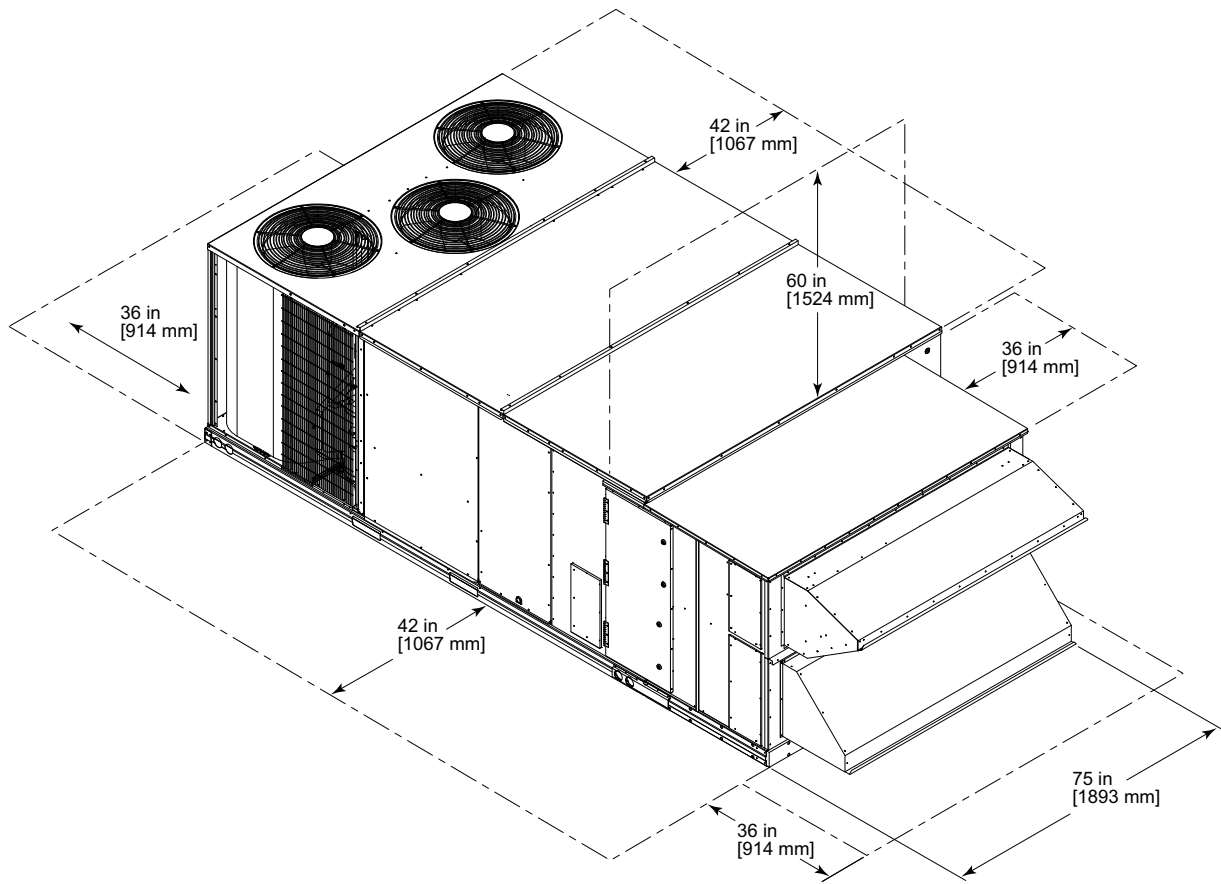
Clearances for ERV on Size 17 & 20 HC Base Units
